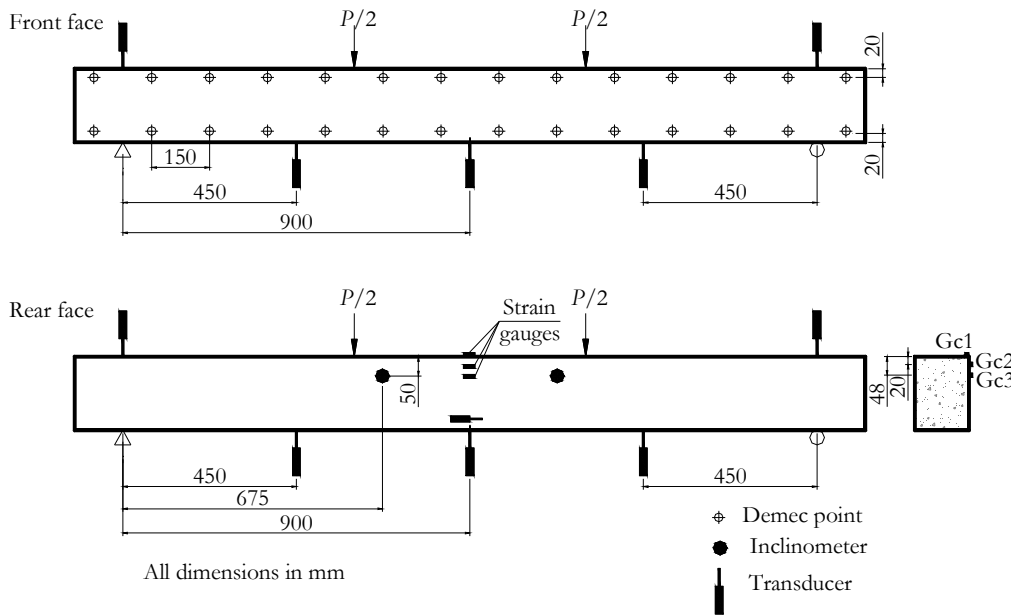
Instrumentation details for beam C1-316-D2-B.
